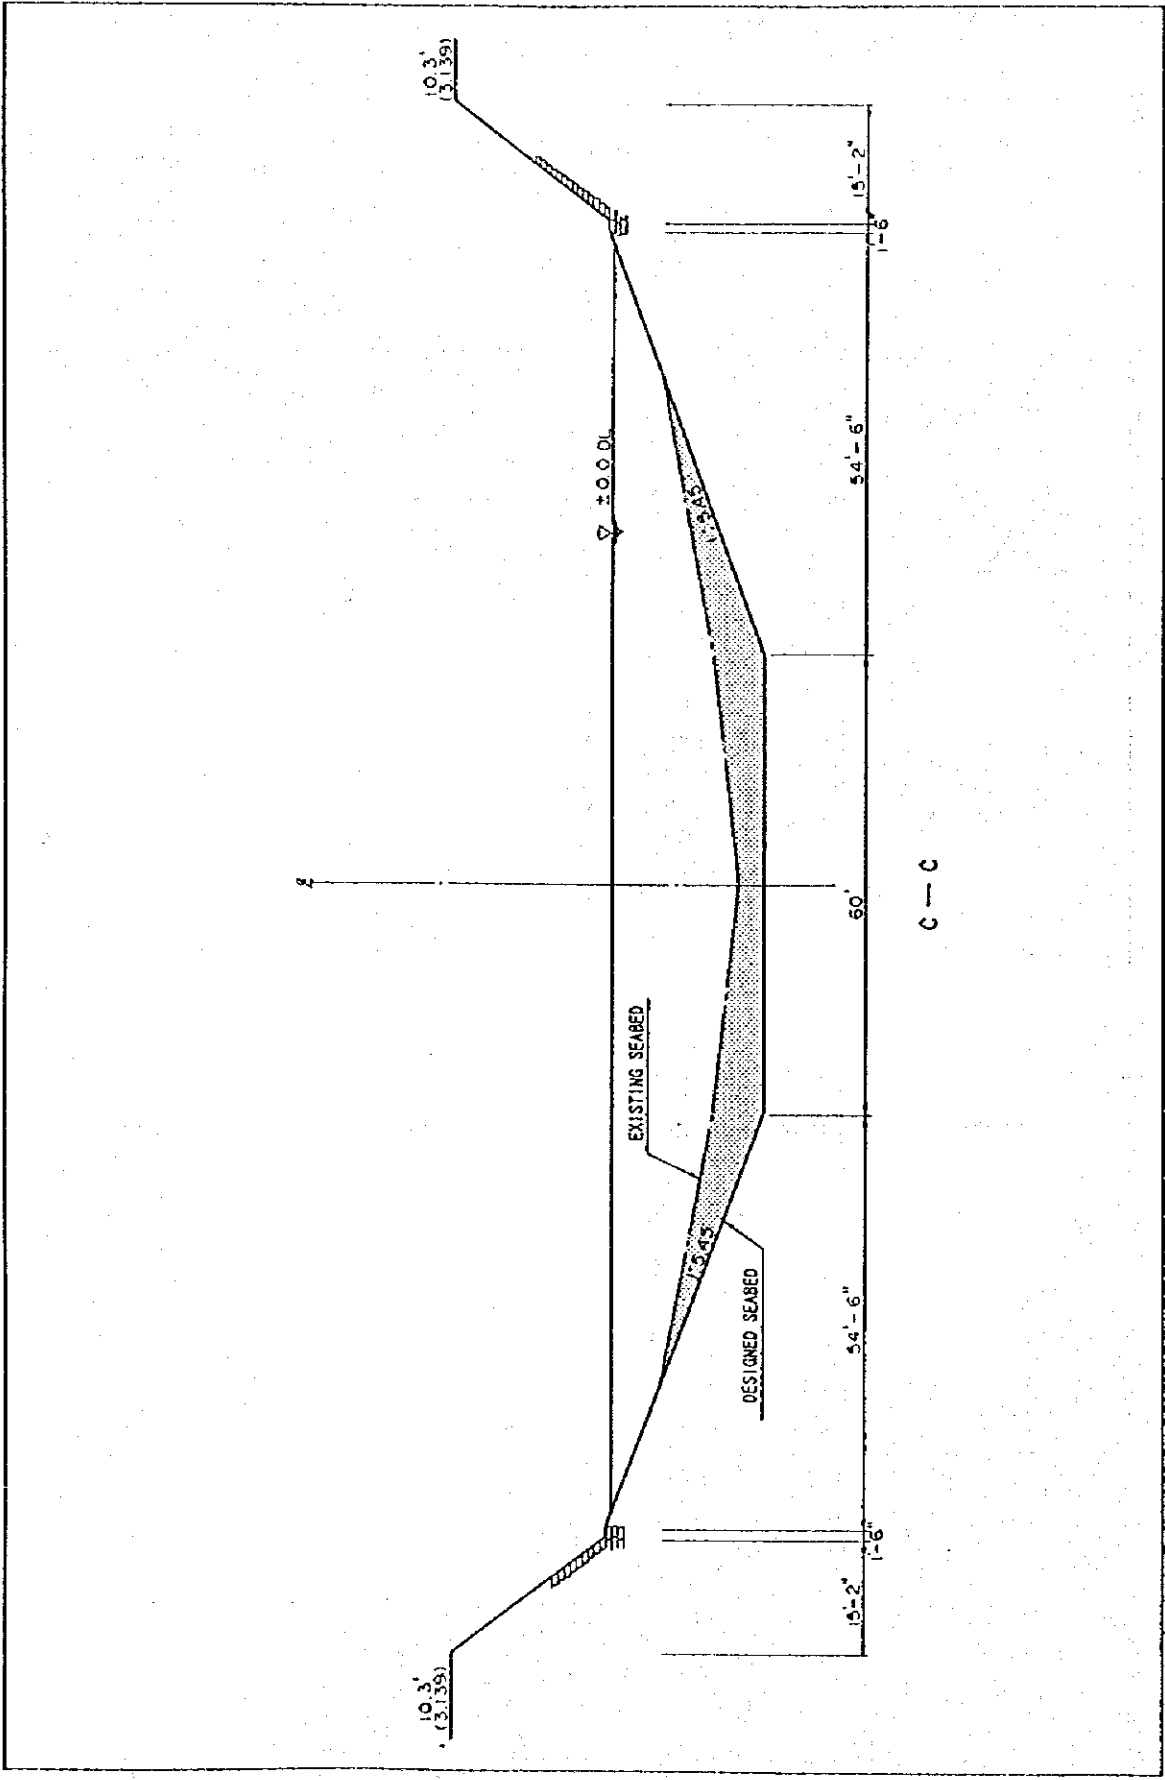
Typical Cross Section of Approach Channel in Betio Port
